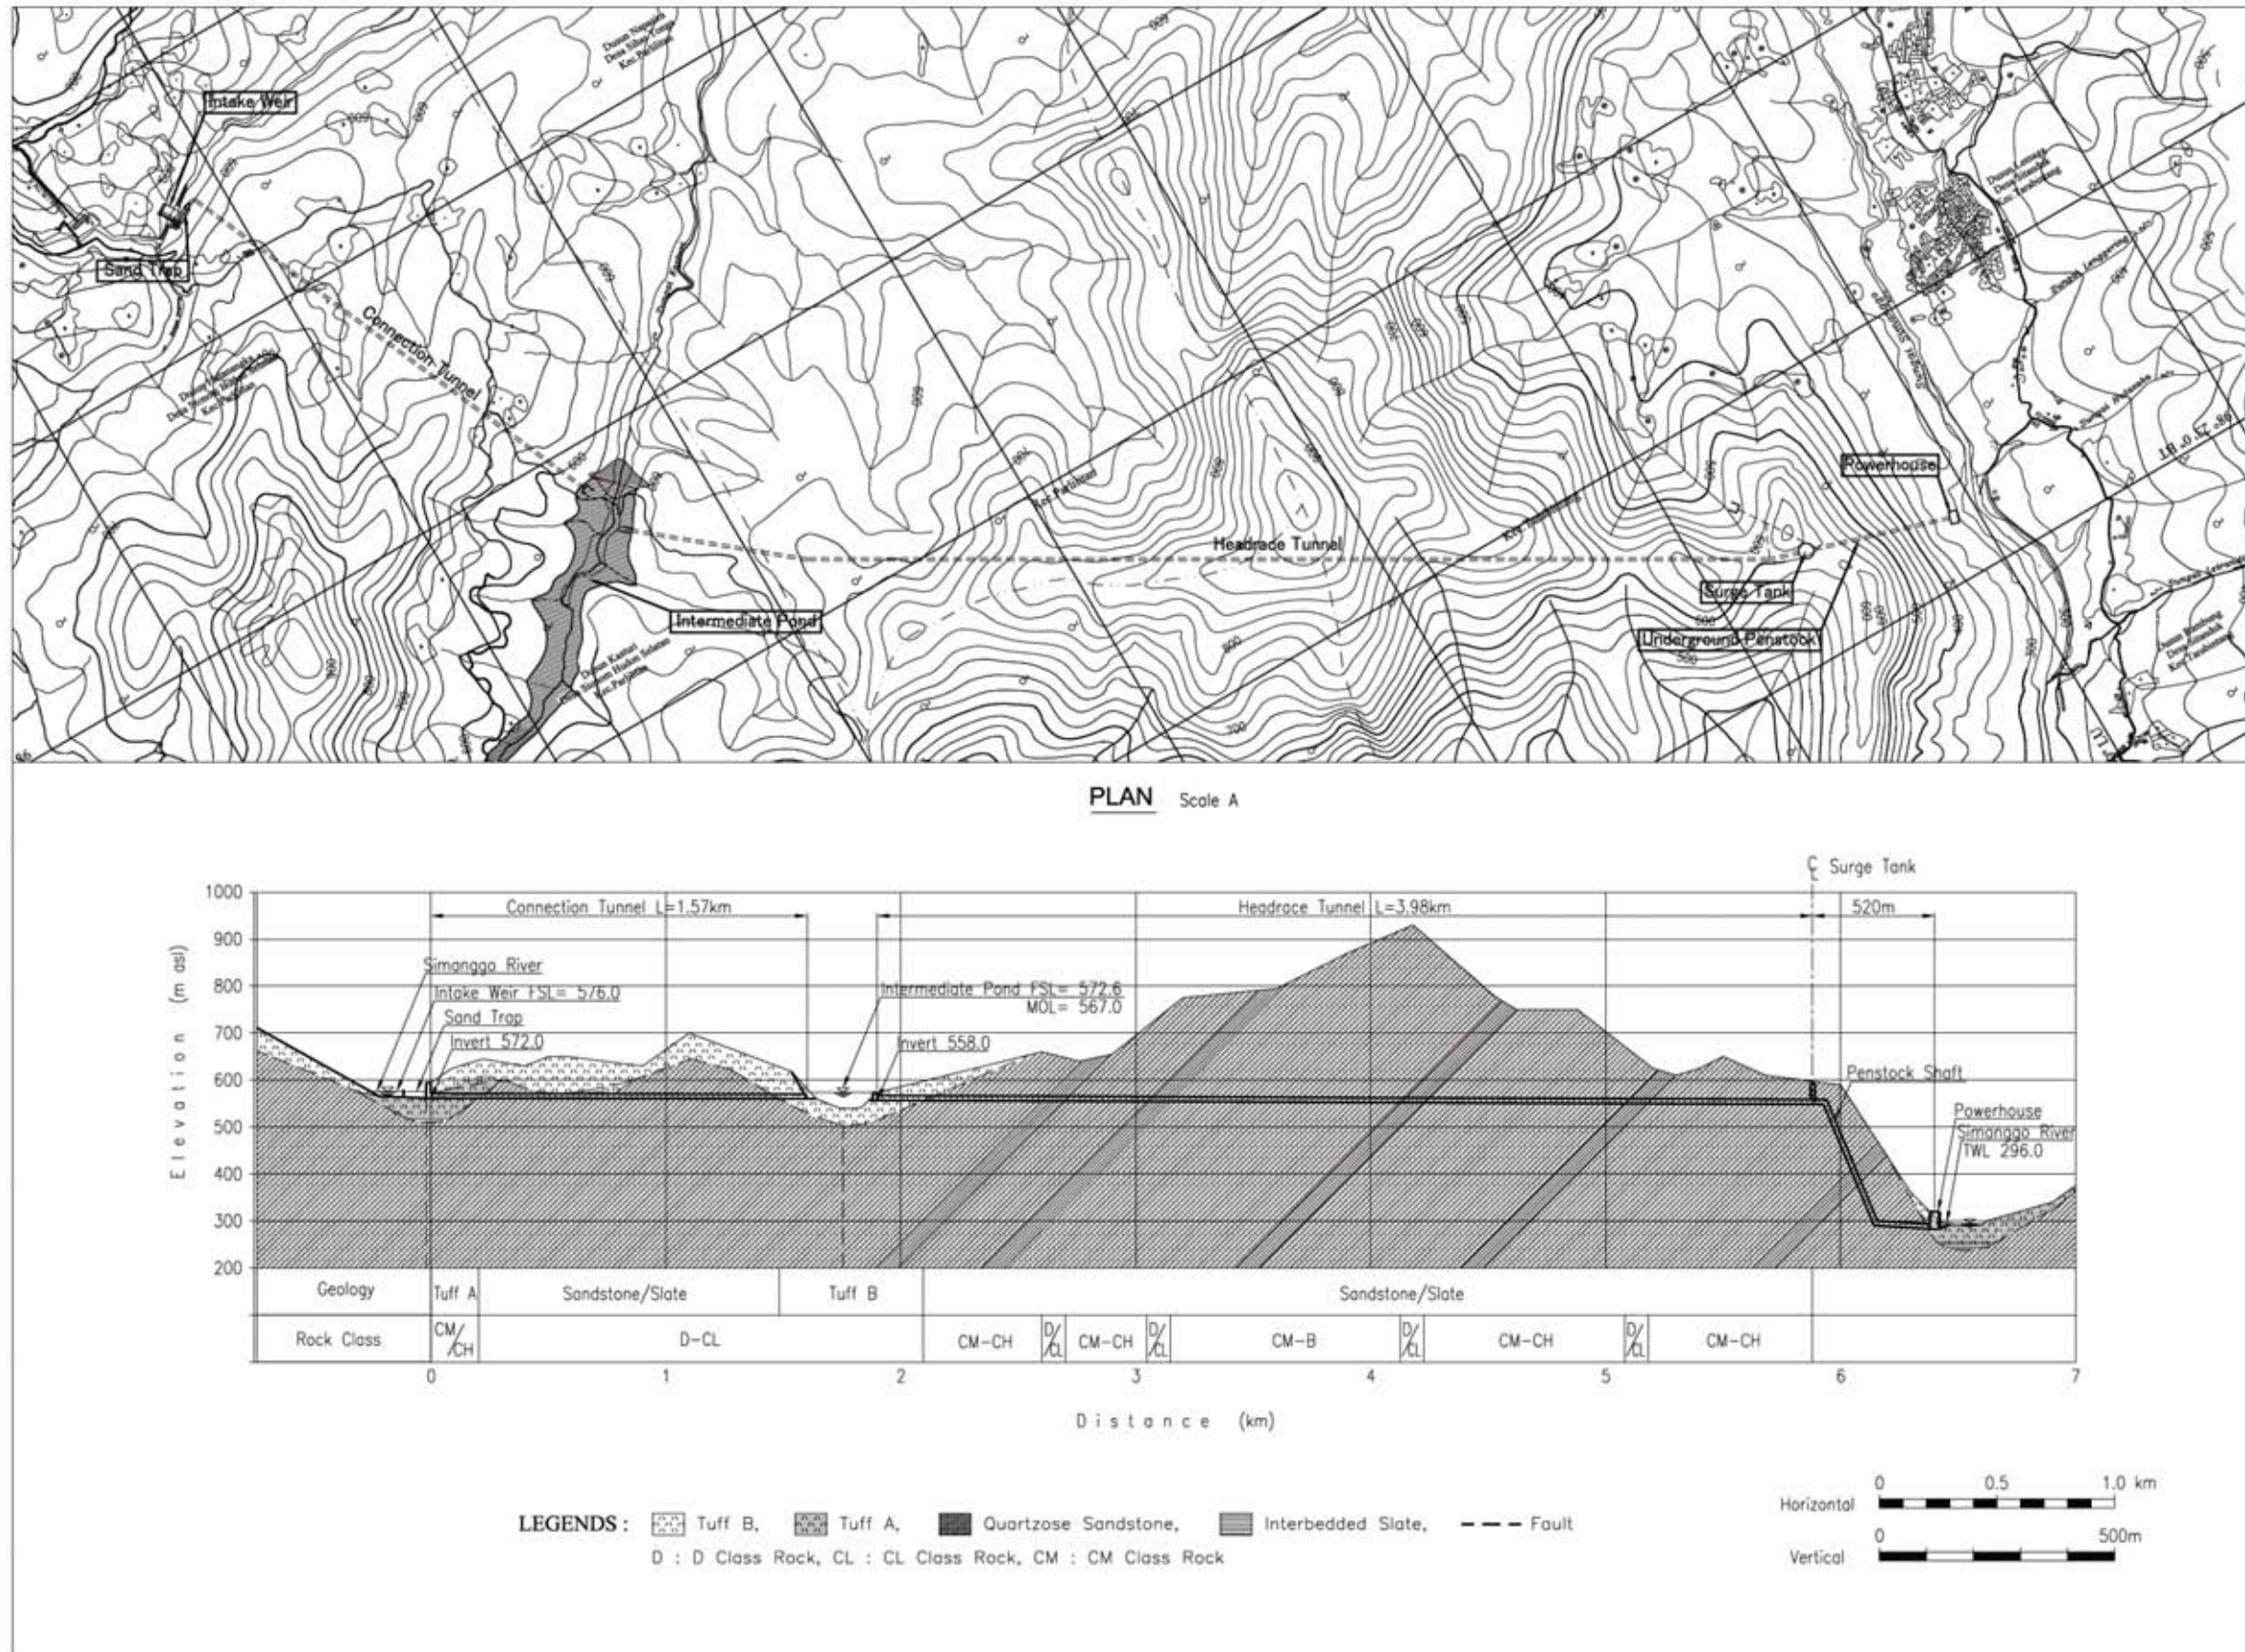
Geological Section along the Connection and Headrace Tunnel Alignment Alternative B
